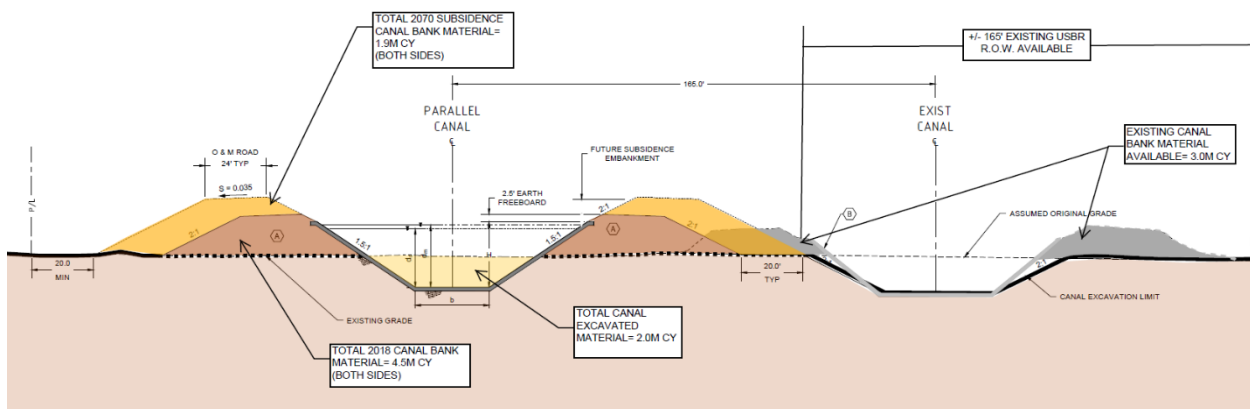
Trapezoidal Cross Section of Realigned Canal Segments in the Recommended Plan
